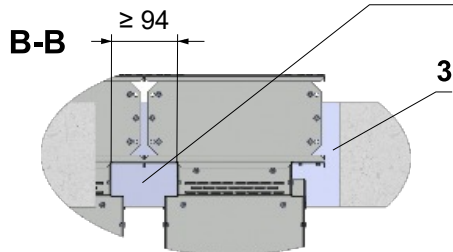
Solid ceiling construction - battery - mortar or gypsum
